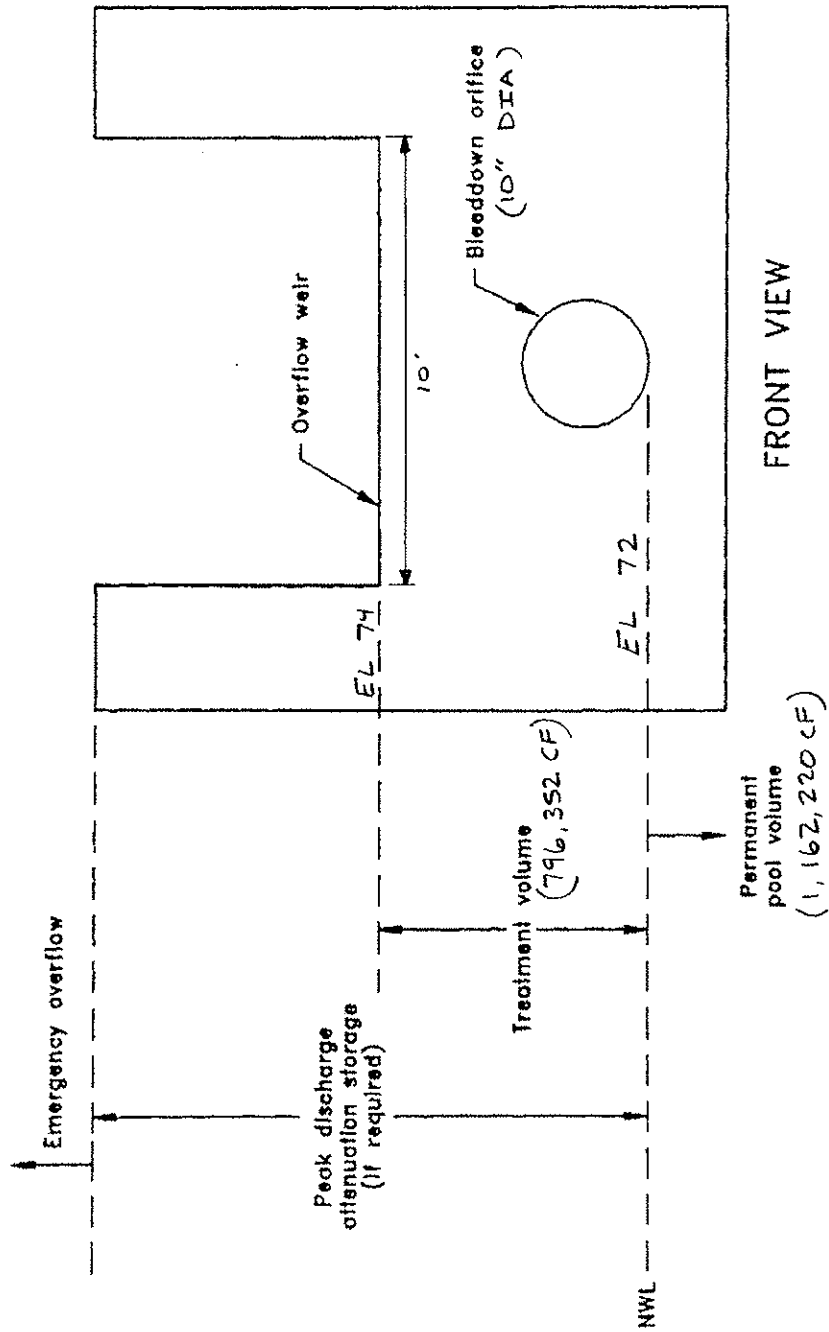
Typical wet detention outfall structure (N.T.S.)
